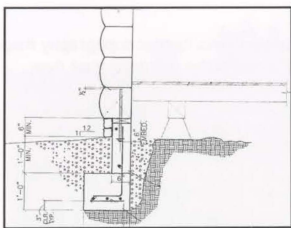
Concrete footing section from east wing repairs 2006. Image from kpff Consulting Engineers, See Appendix-B 5-501.
